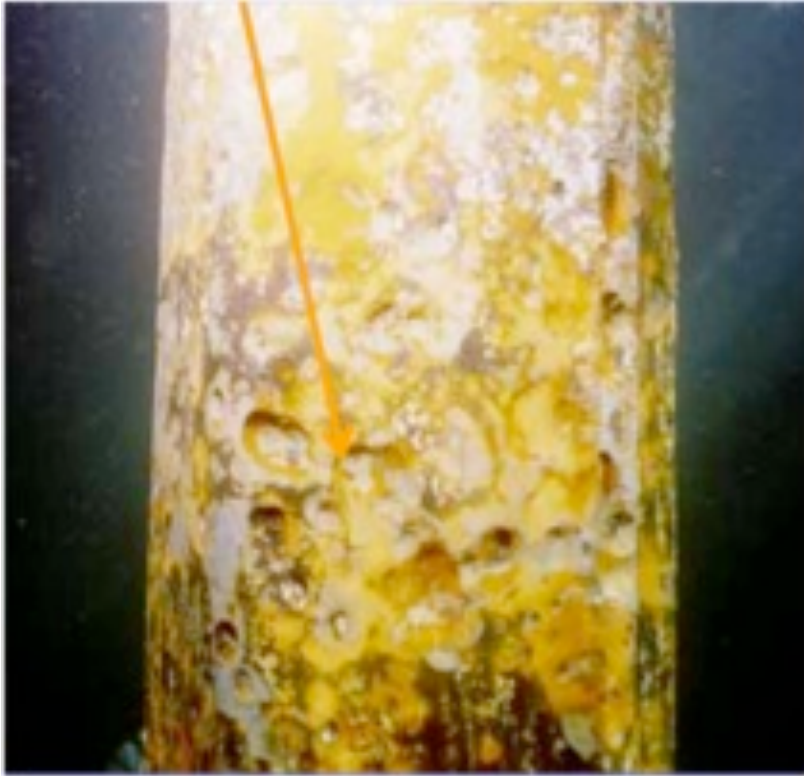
Pitting and wall perforation of steel piles by MIC.²⁸
